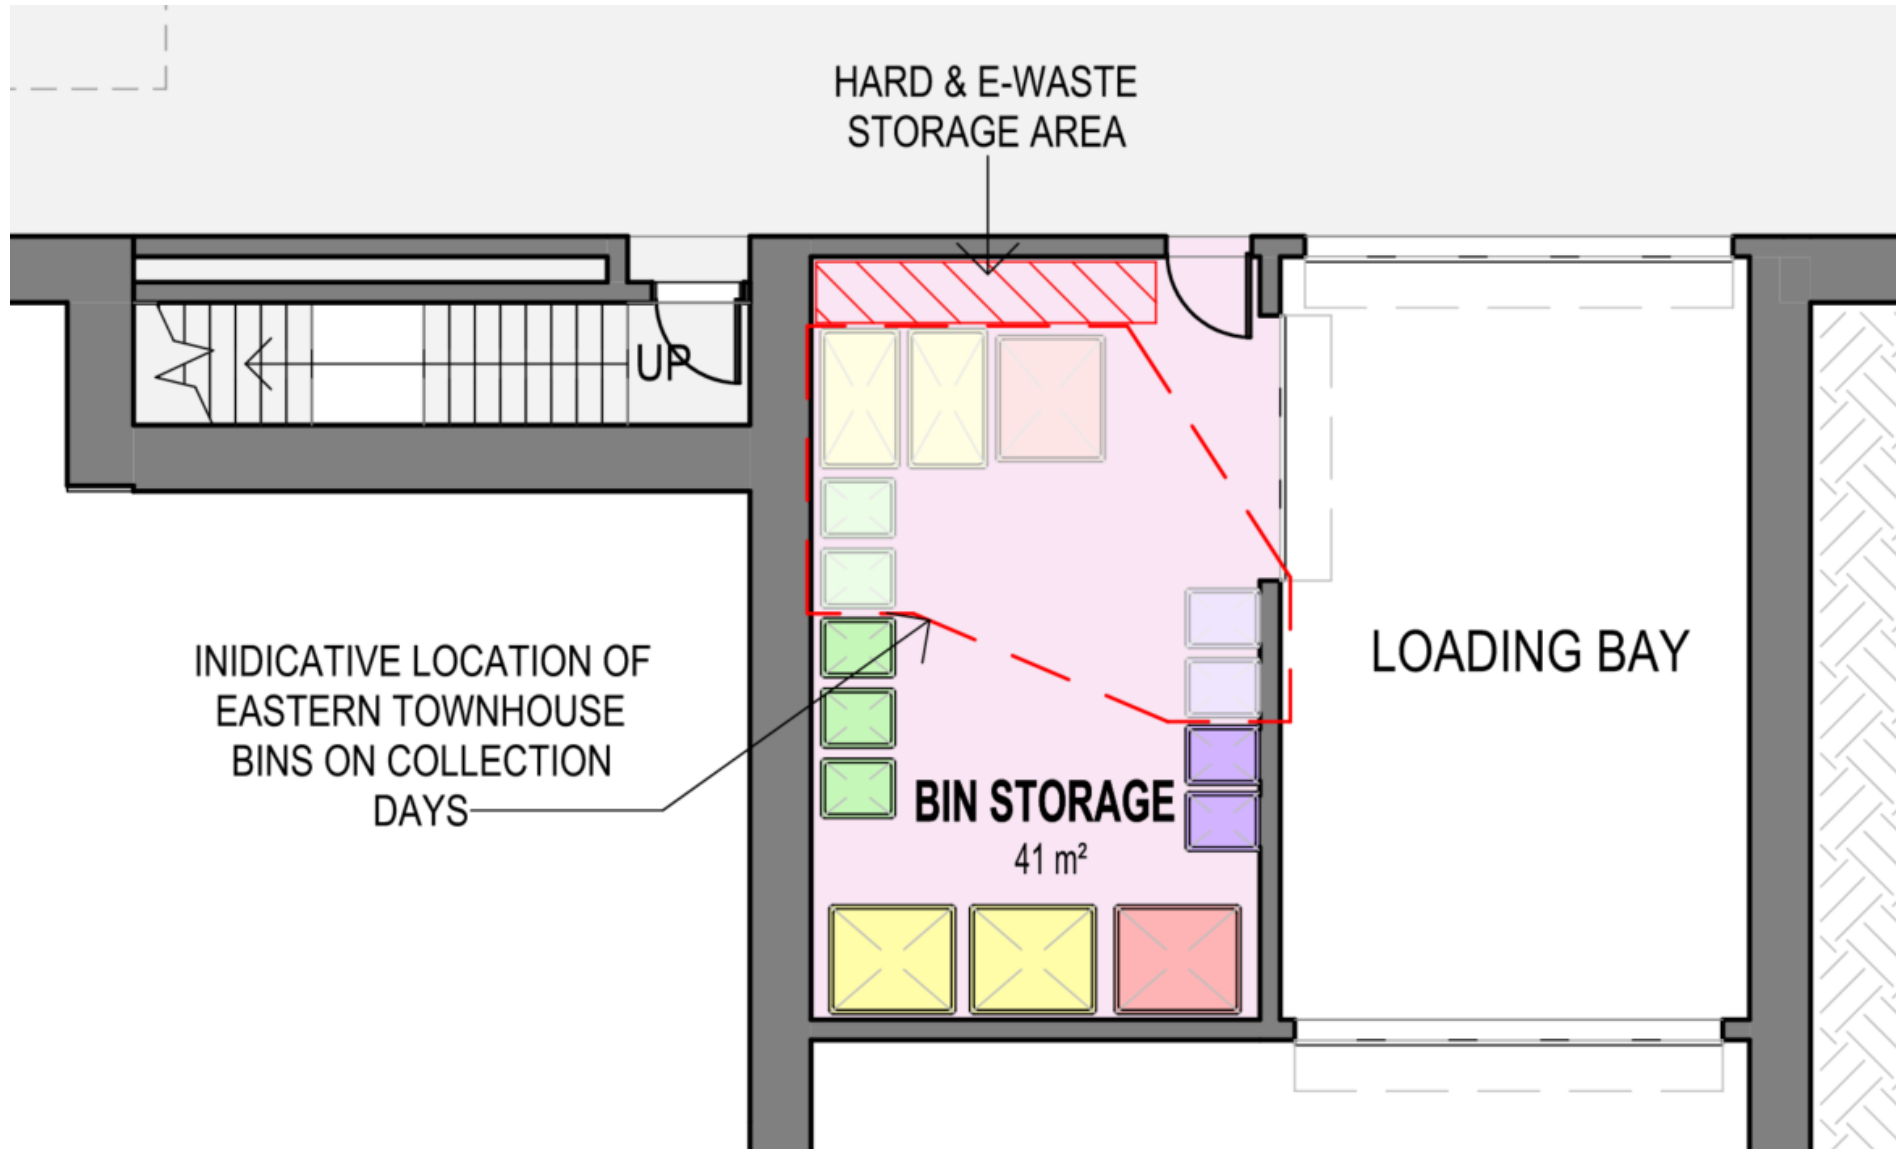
Bin Room Layout - Building C (Apartments - Northern)
